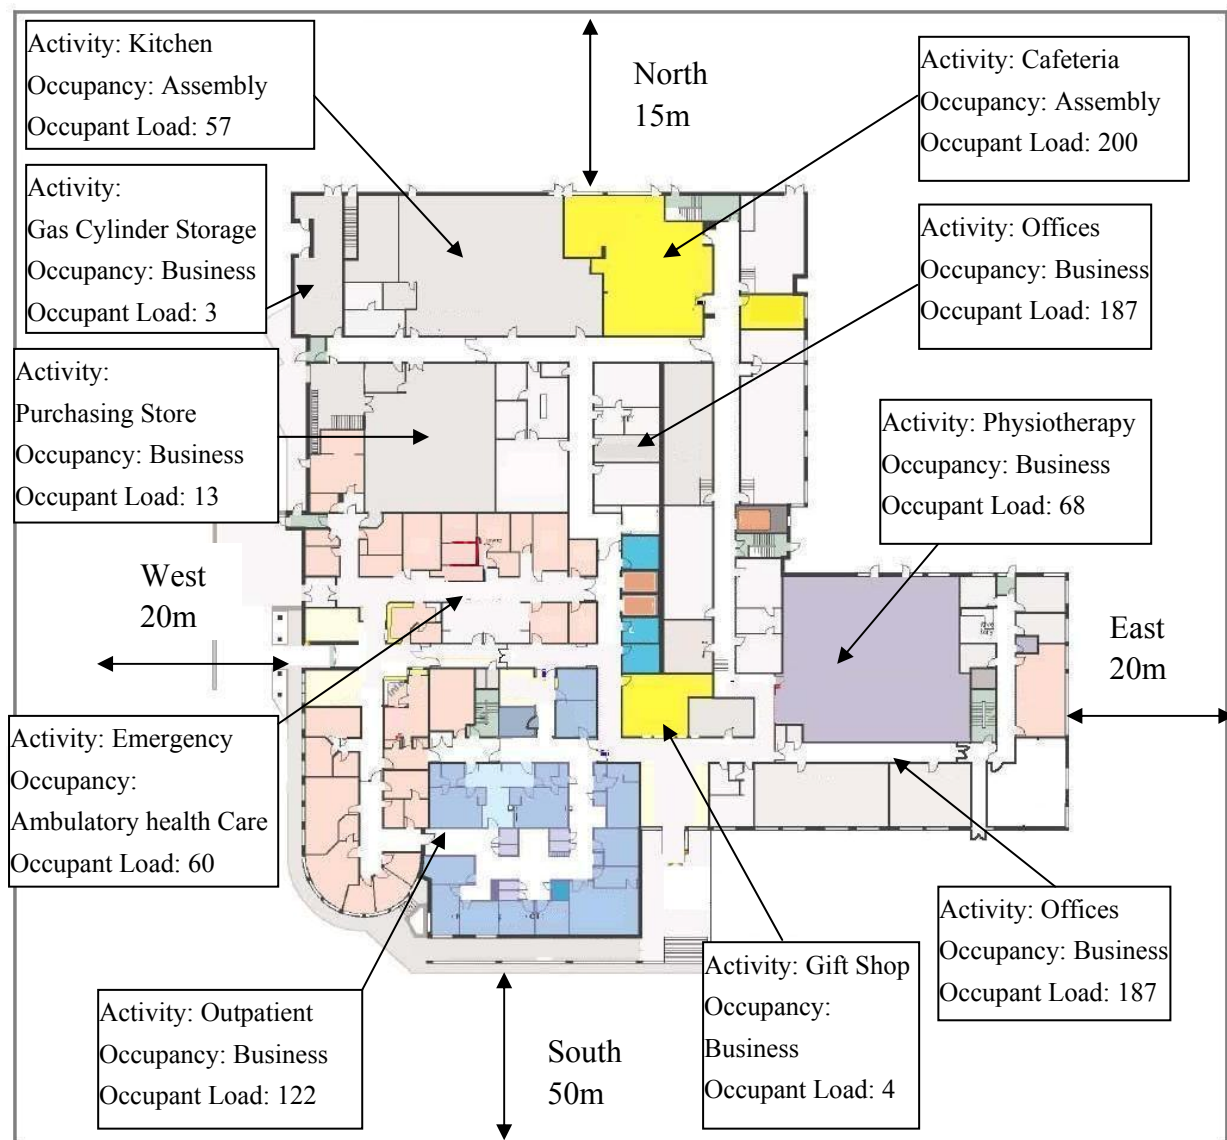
Building layout, relevant boundary, activity, occupancy type and occupant load on floor 1
